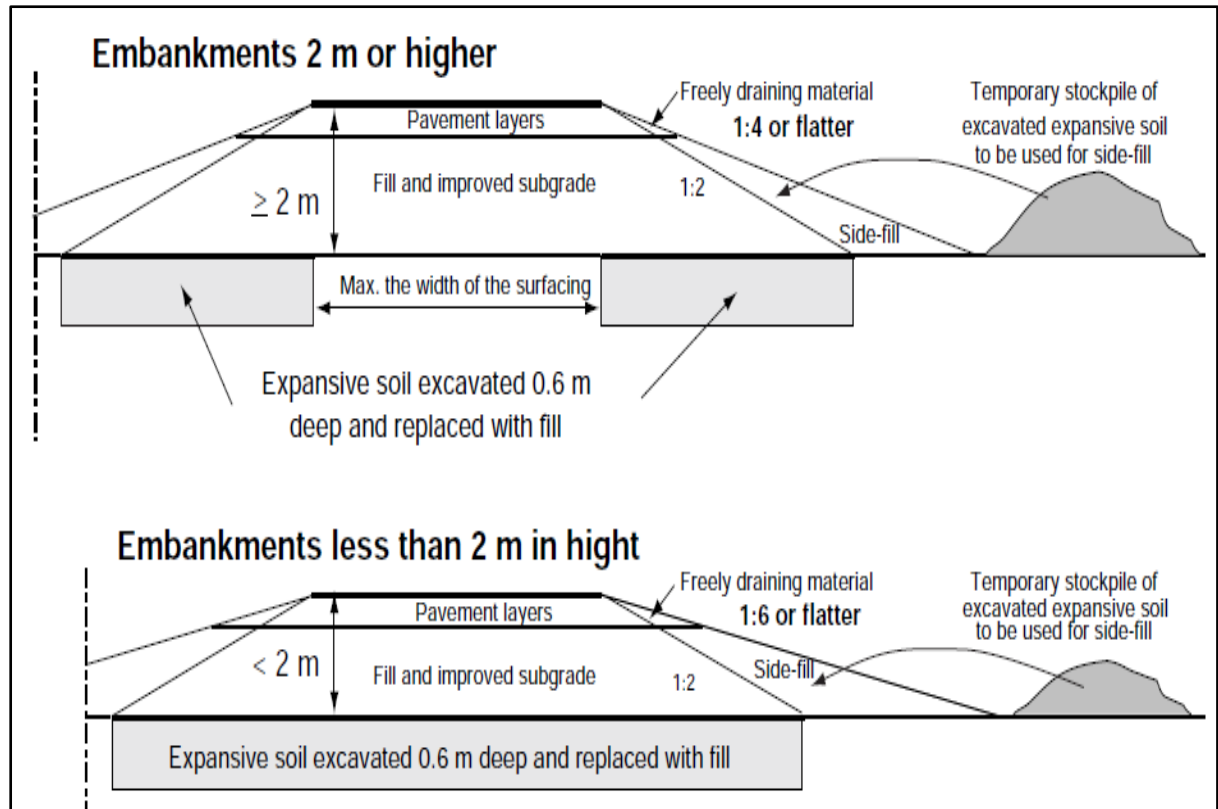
Cross-section and construction on expansive soil with soil replacement depth (Tanzania PDM URTMW, 1999)
